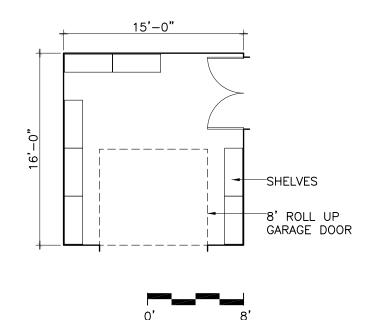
Housing Maintenance Building Grounds Equipment Room Diagram
